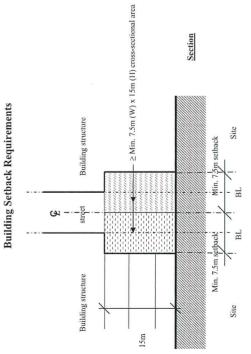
Building setback as detailed in paragraph 7(a) of this PNAP
